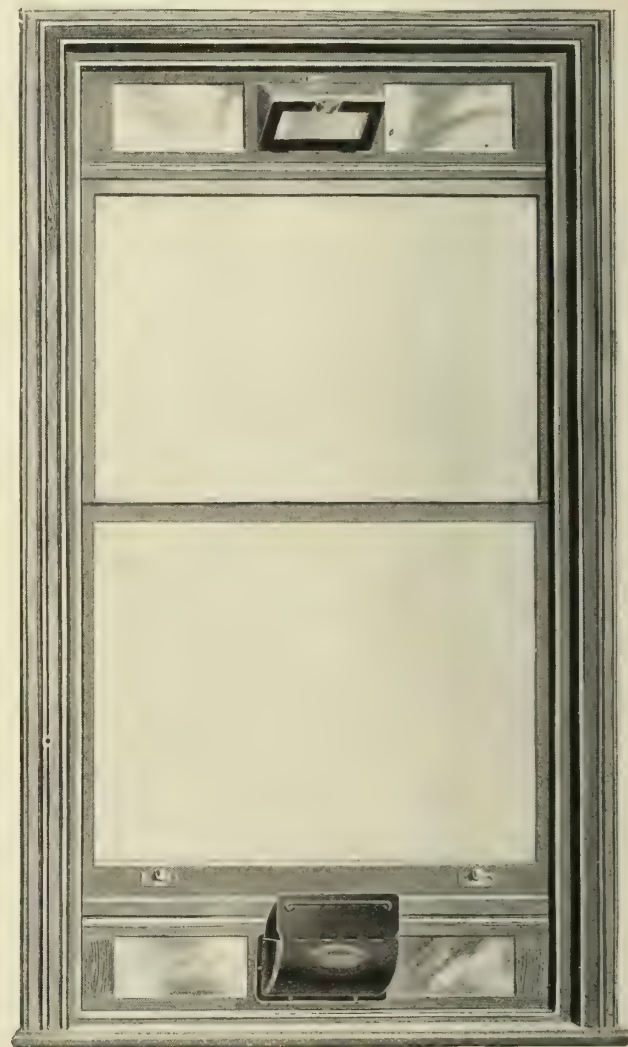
INSIDE VIEW OF MOBILE AND VICTOR INSTALLATION
